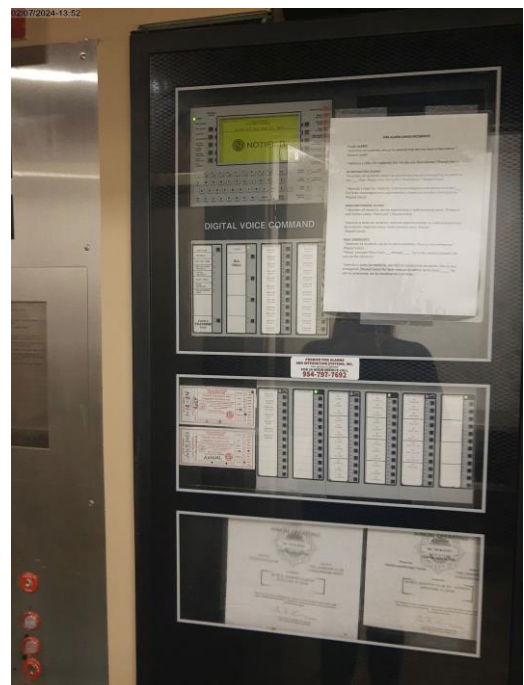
Item 20.1. Fire Alarm Central Panel.
